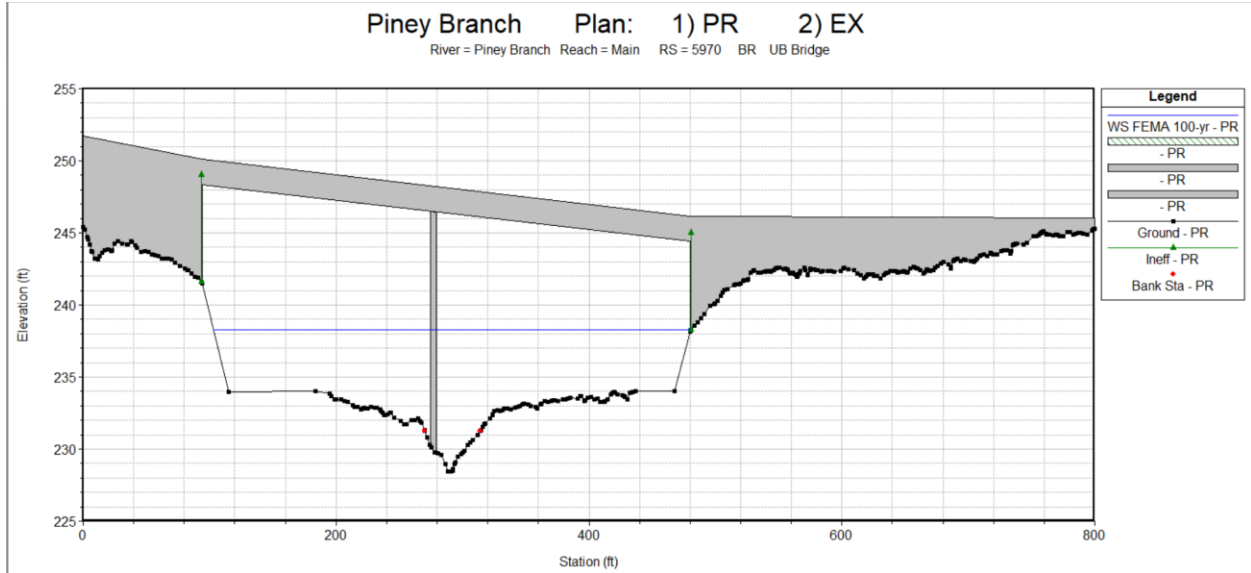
Bridge Downstream Internal Cross Section Proposed Geometry
